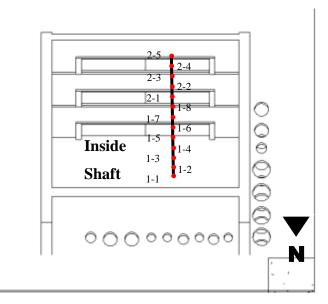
TC inside elevator shaft from 5th to 3rd floor
